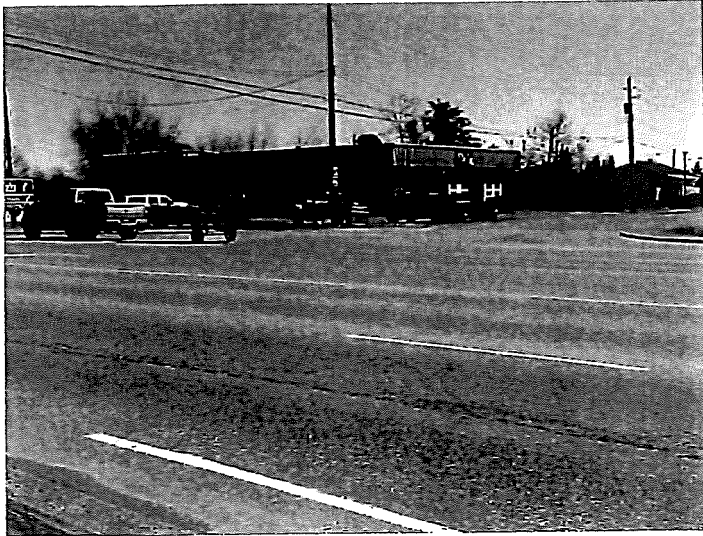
Auto Body Shop just South of the Subject Lands across Highway 144
